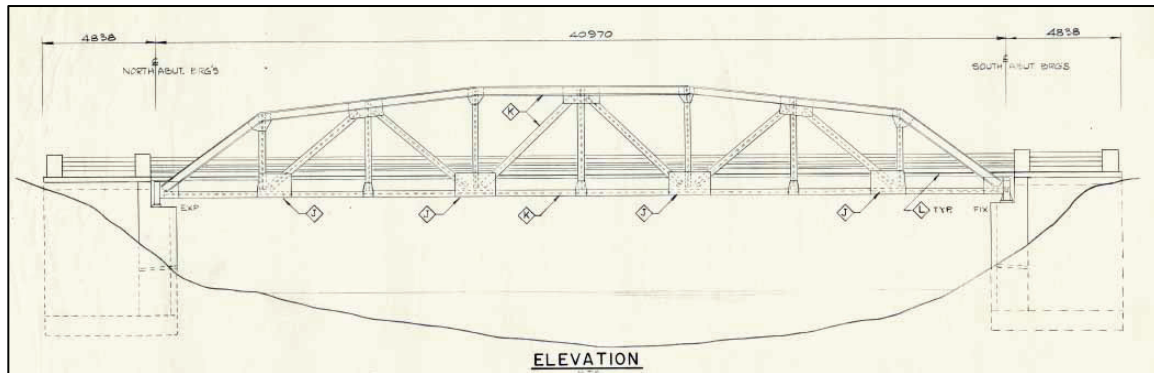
Elevation of the Bosworth Bridge [MRC, 1987].
